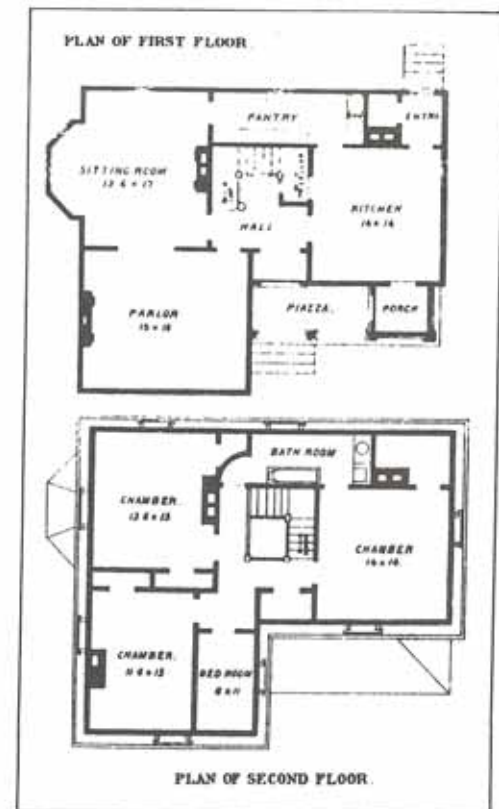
House Plan, Bicknell's Victorian Buildings (1878)
